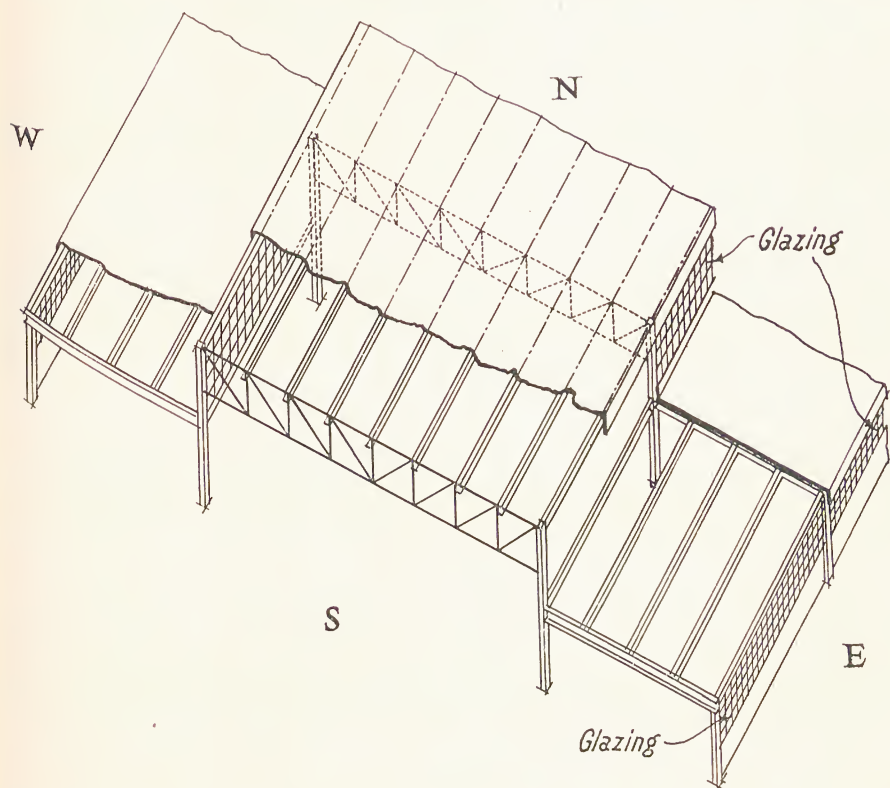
ENLARGED DETAIL OF ROOF CONSTRUCTION FOR ADVANCED TYPE OF FACTORY SHOWN AT THE BOTTOM OF FIG. 12. THIS SHOWS THE ORIENTATION
